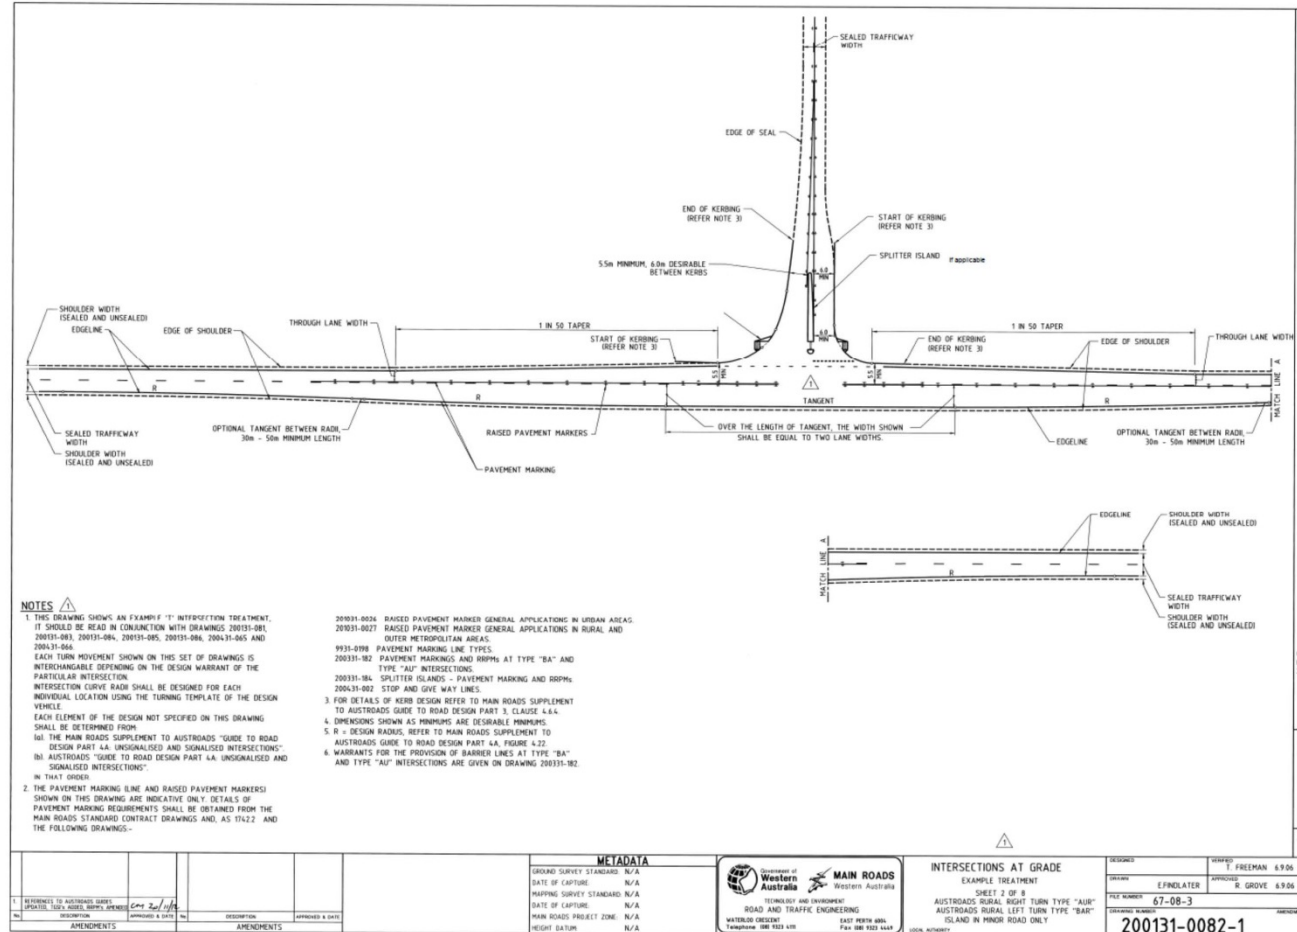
Proposed intersection treatment M037 and CBH/Field Day Access Rd at subject site
